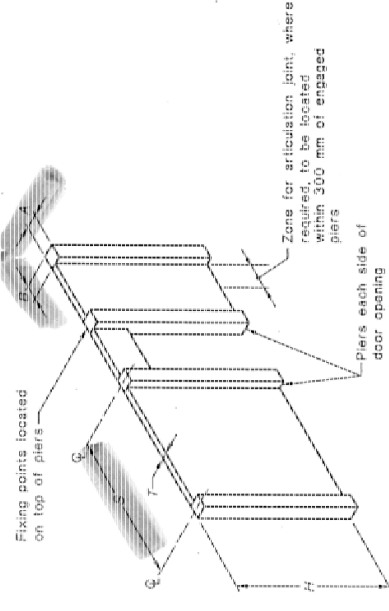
ENGAGED PIERS IN EXTERNAL SINGLE-LEAF WALLS
